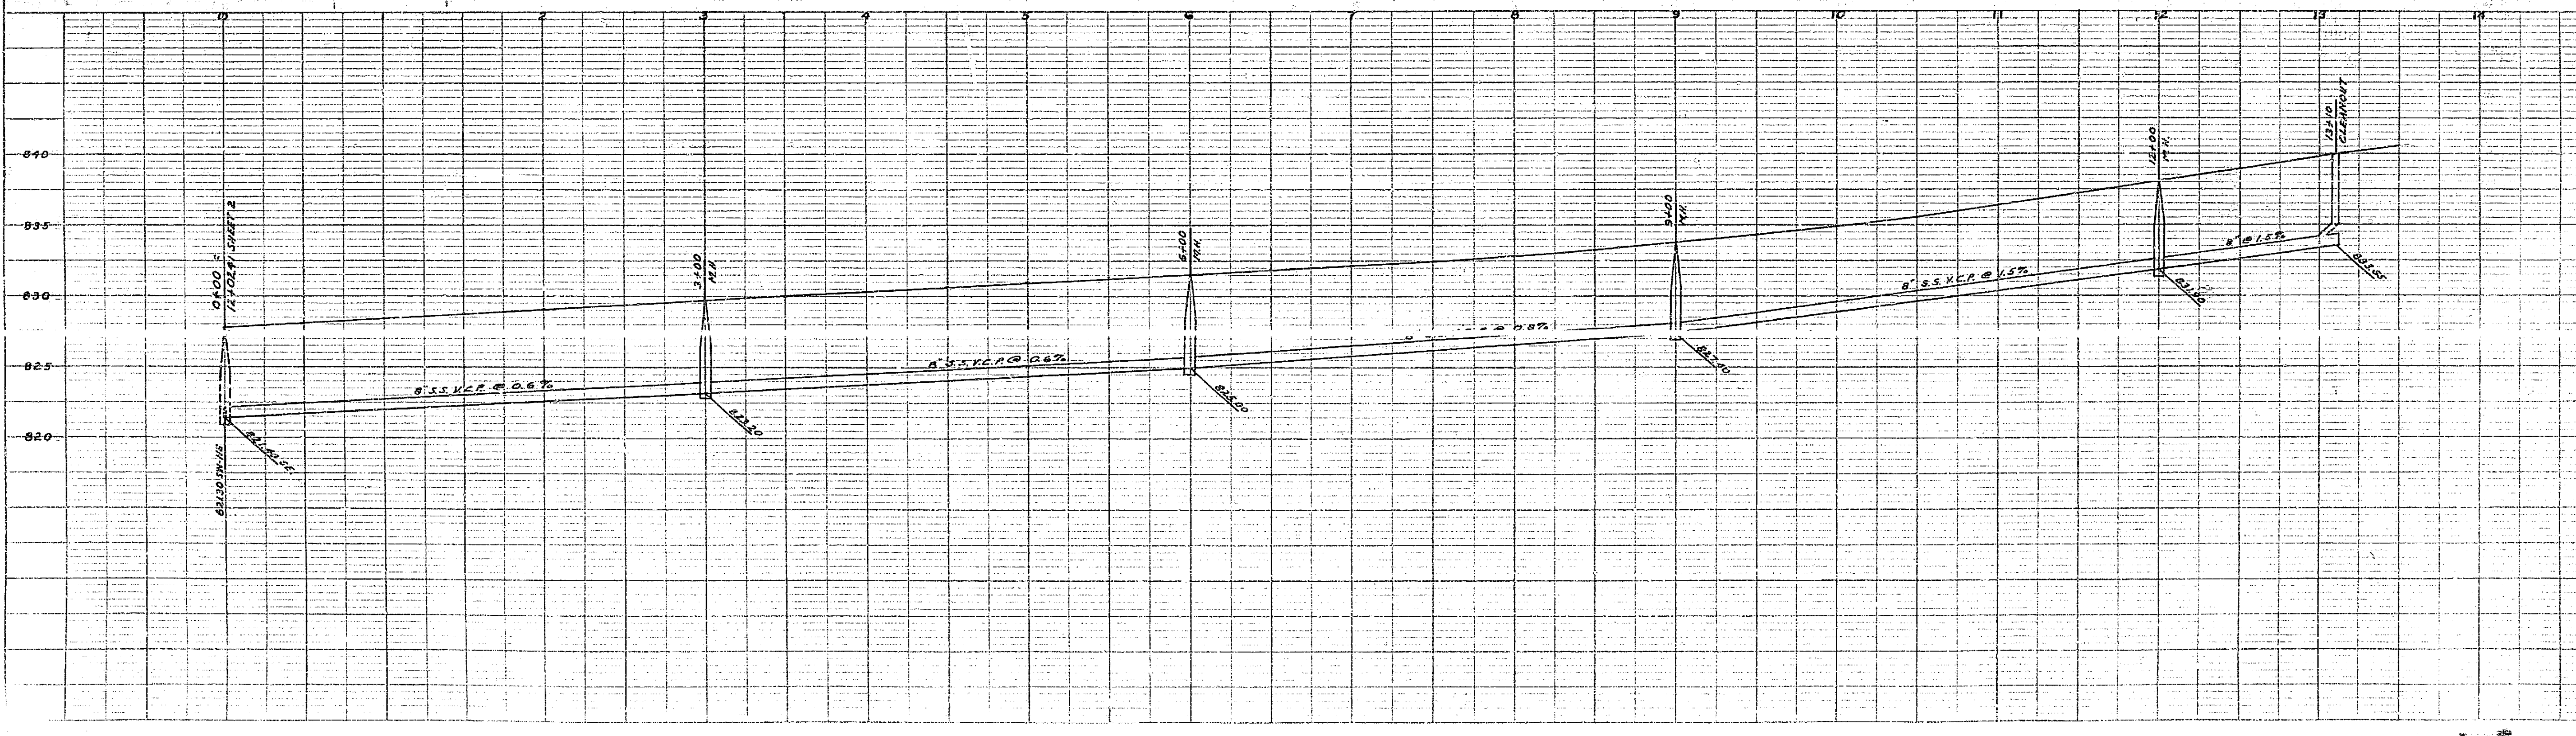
PLAN & PROFILE OF 2' & 4' & 6' STANDARD
